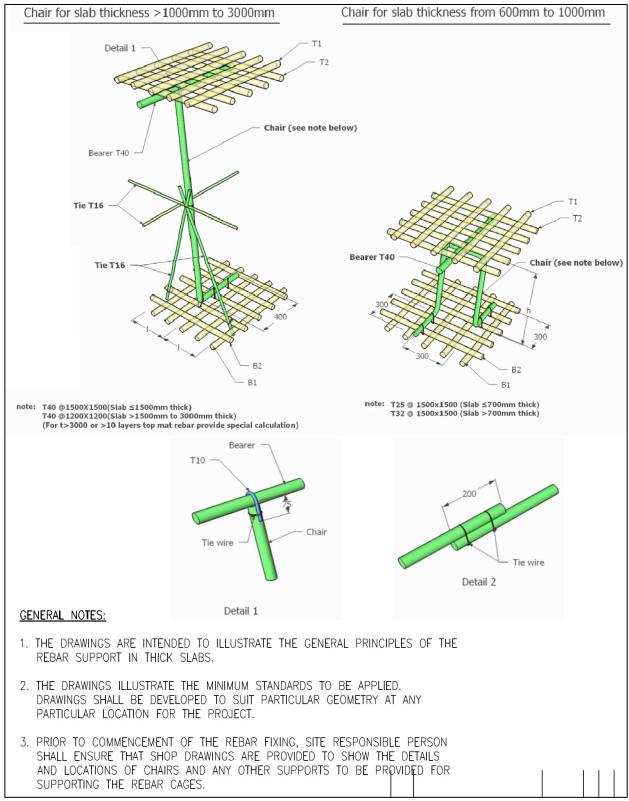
Typical details for support for rebar mats in heavy slabs and transfer plate (1 of 3)
